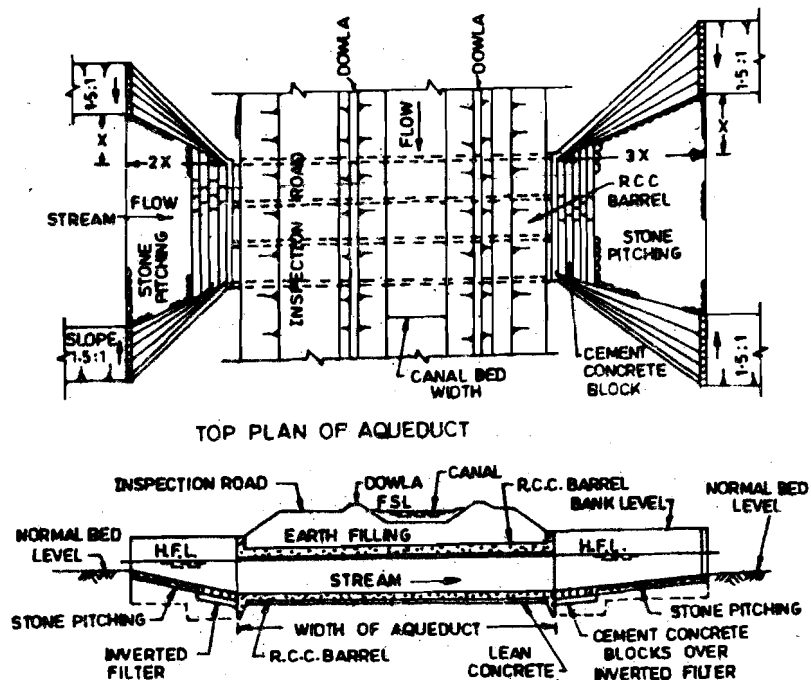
Typical Plan and Section of an Aqueduct (Type I)
